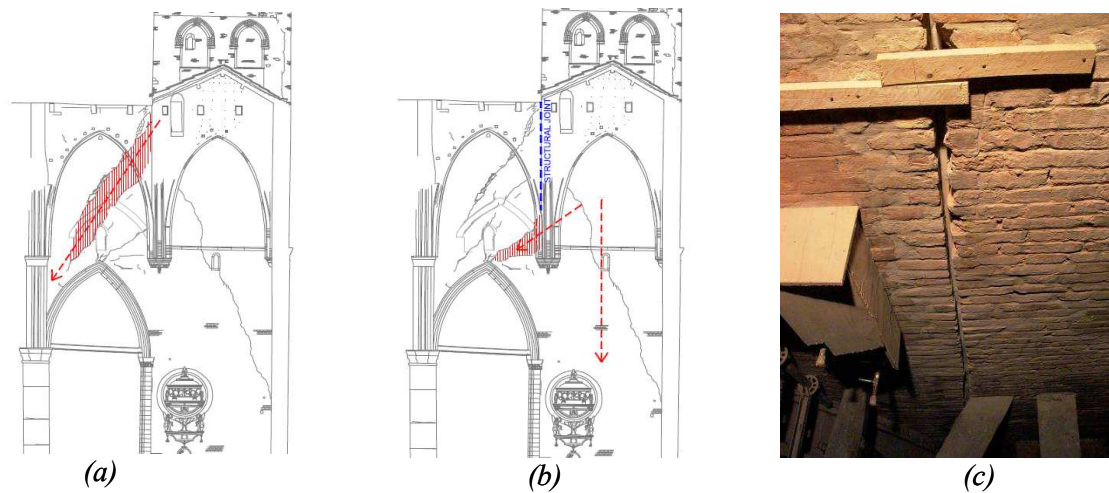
Static situation and loads transmission between tower and church before (a) and after (b) the proposed intervention. Execution of the structural joint (c)
